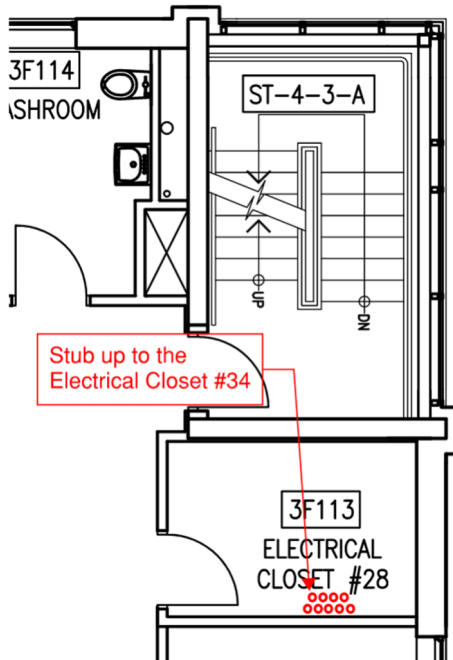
Proposed conduits stub up in Electrical Closet #28
